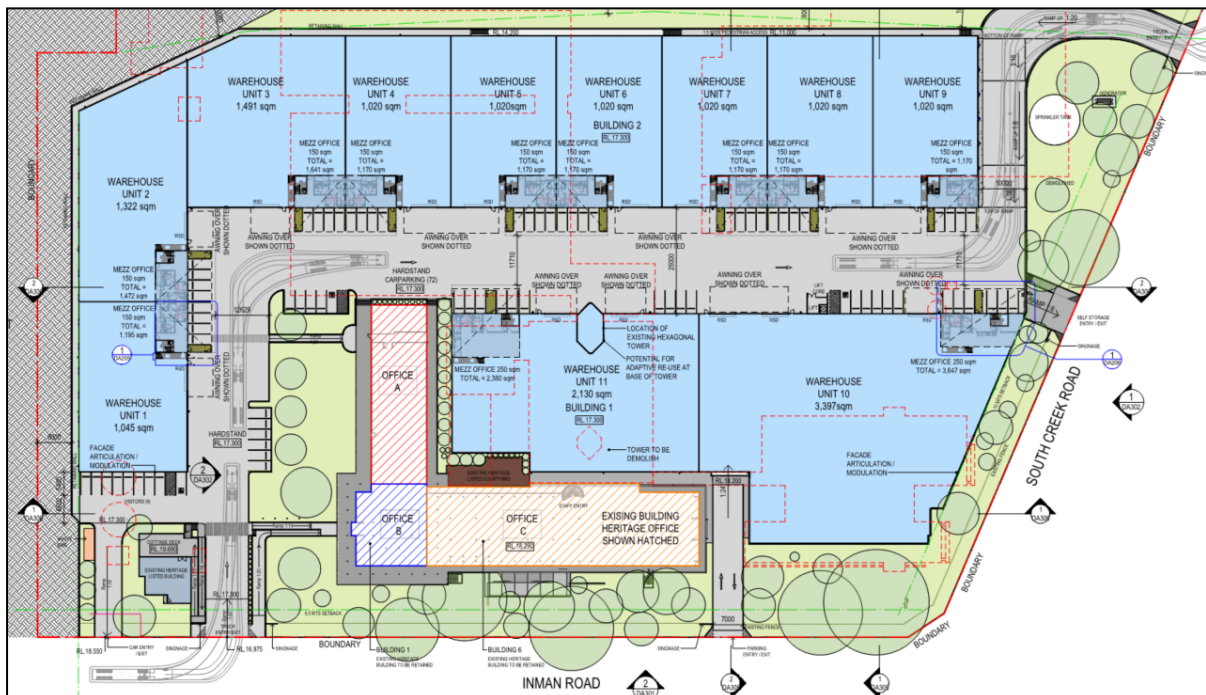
Stamped Plan - DA2019/1346 (Source: EG, 2023)
